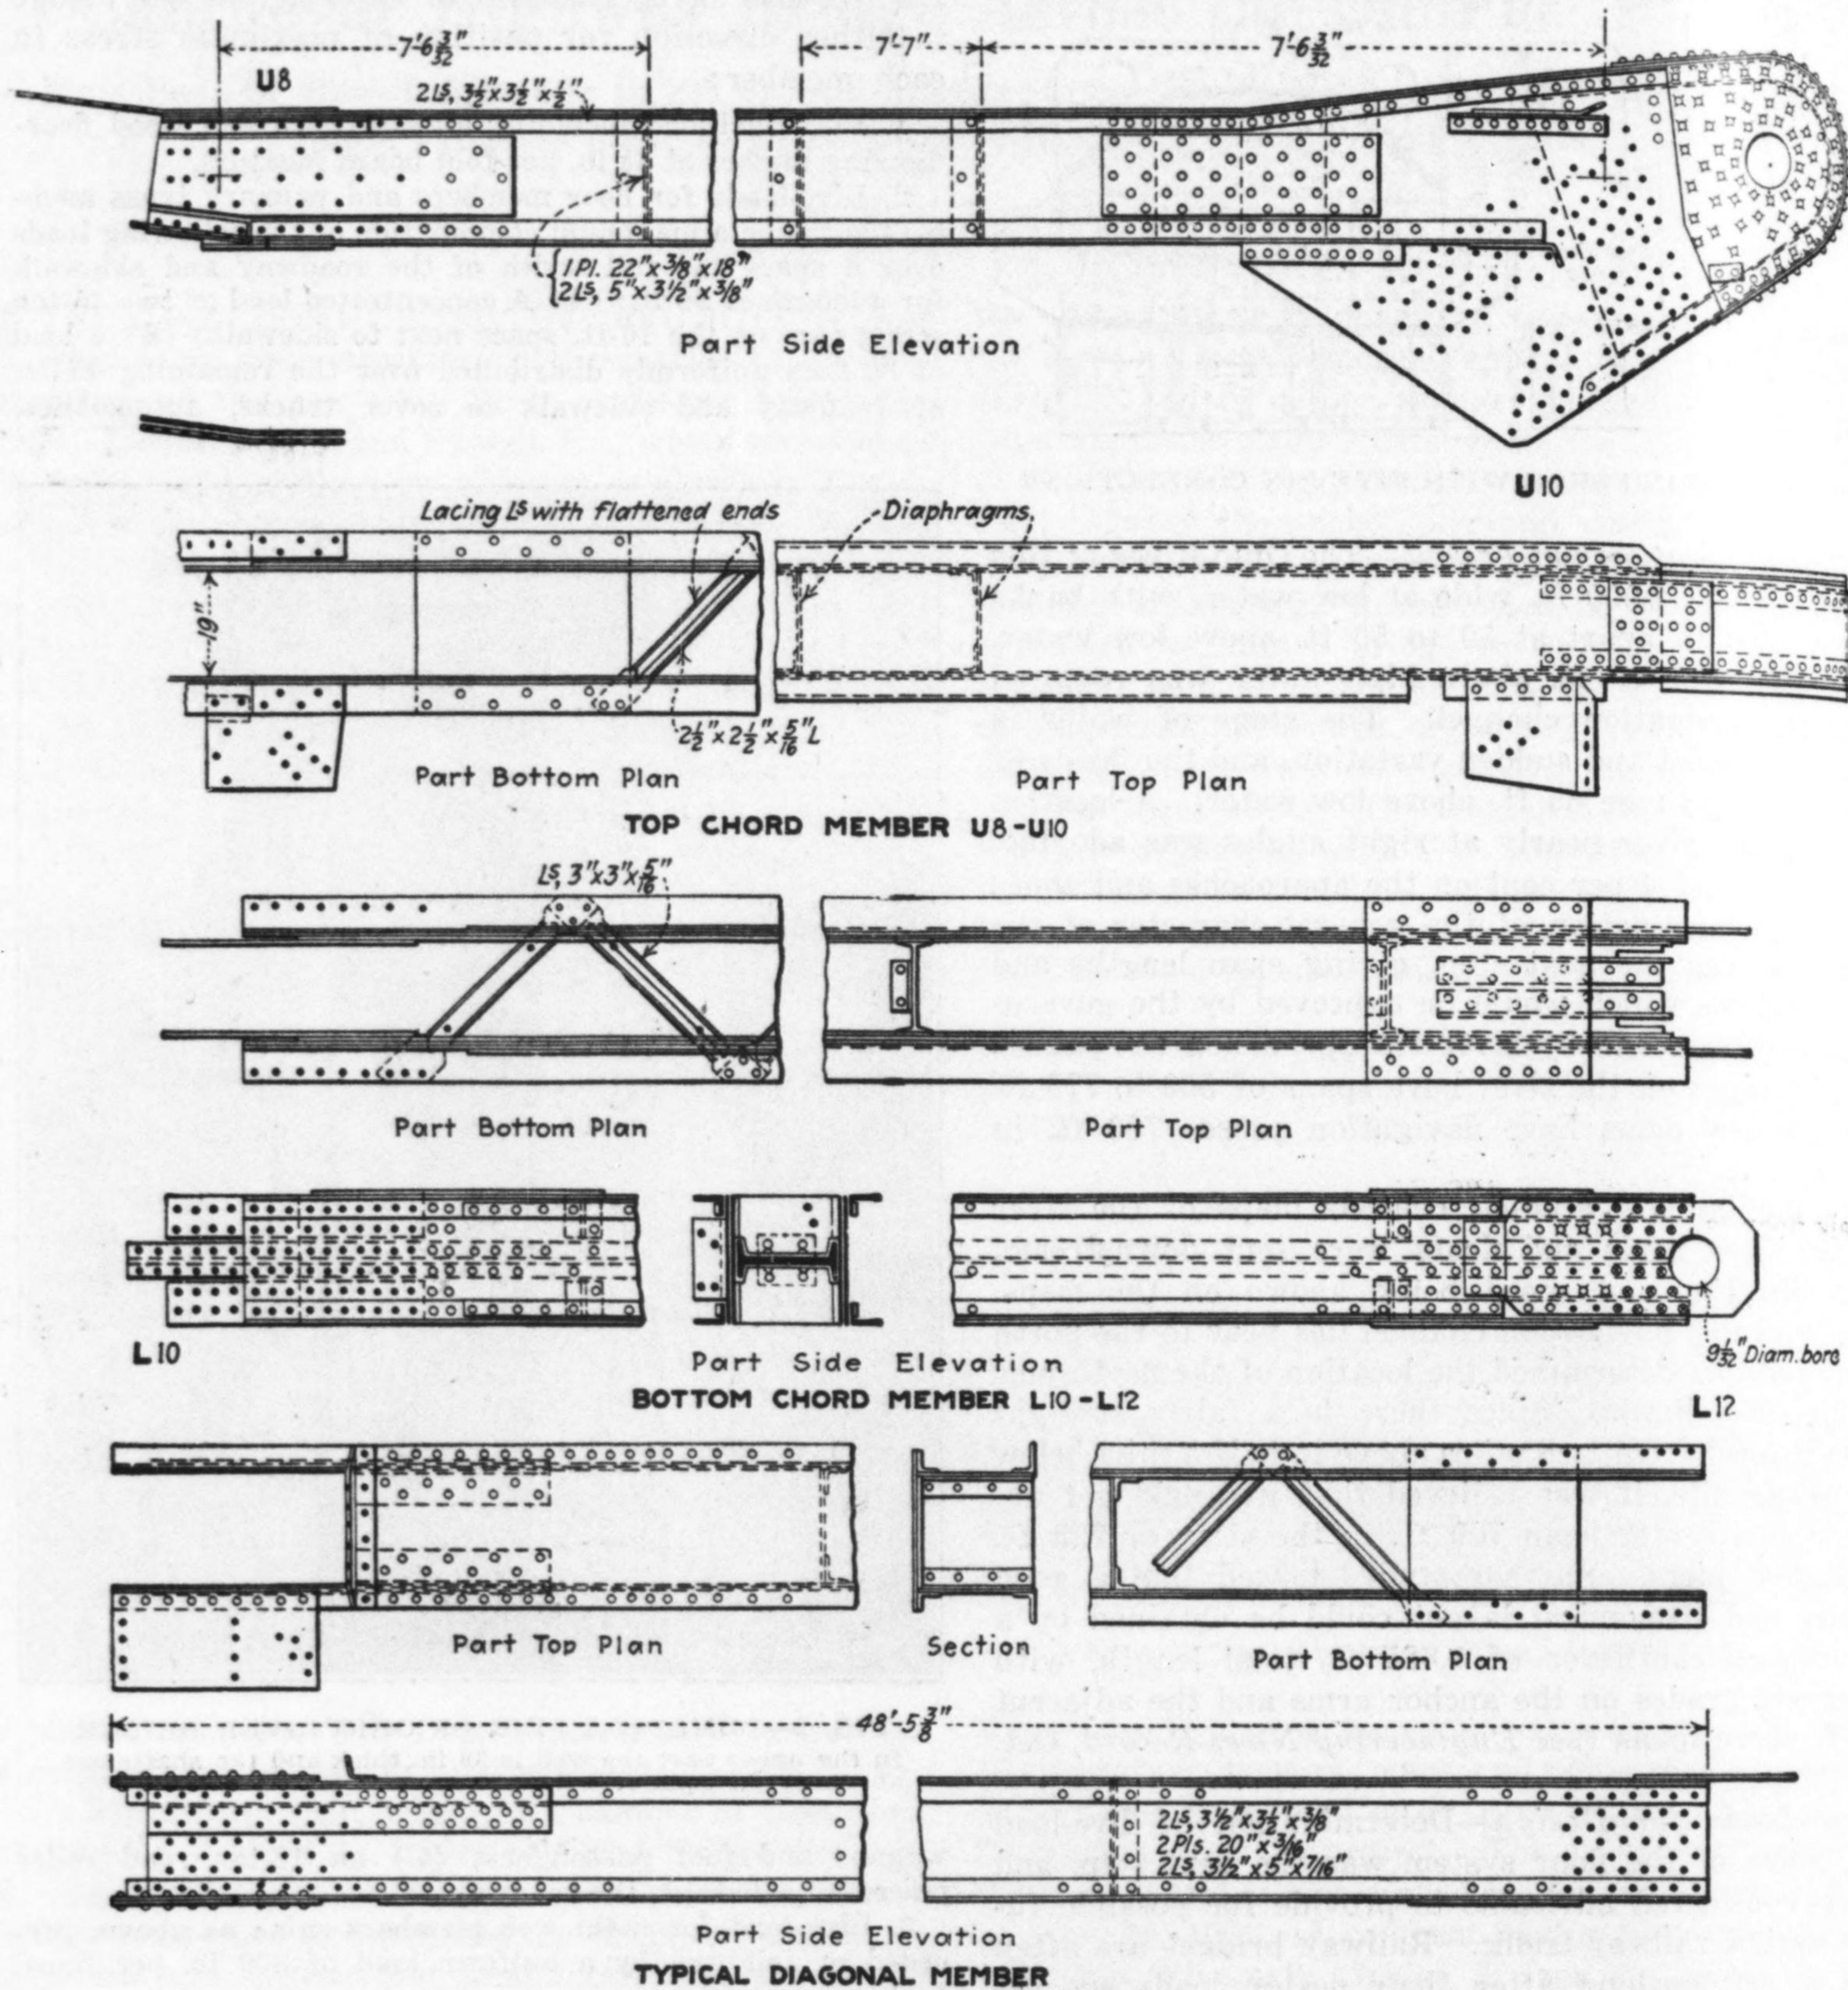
TYPICAL TRUSS MEMBERS OF ANCHOR ARMS
